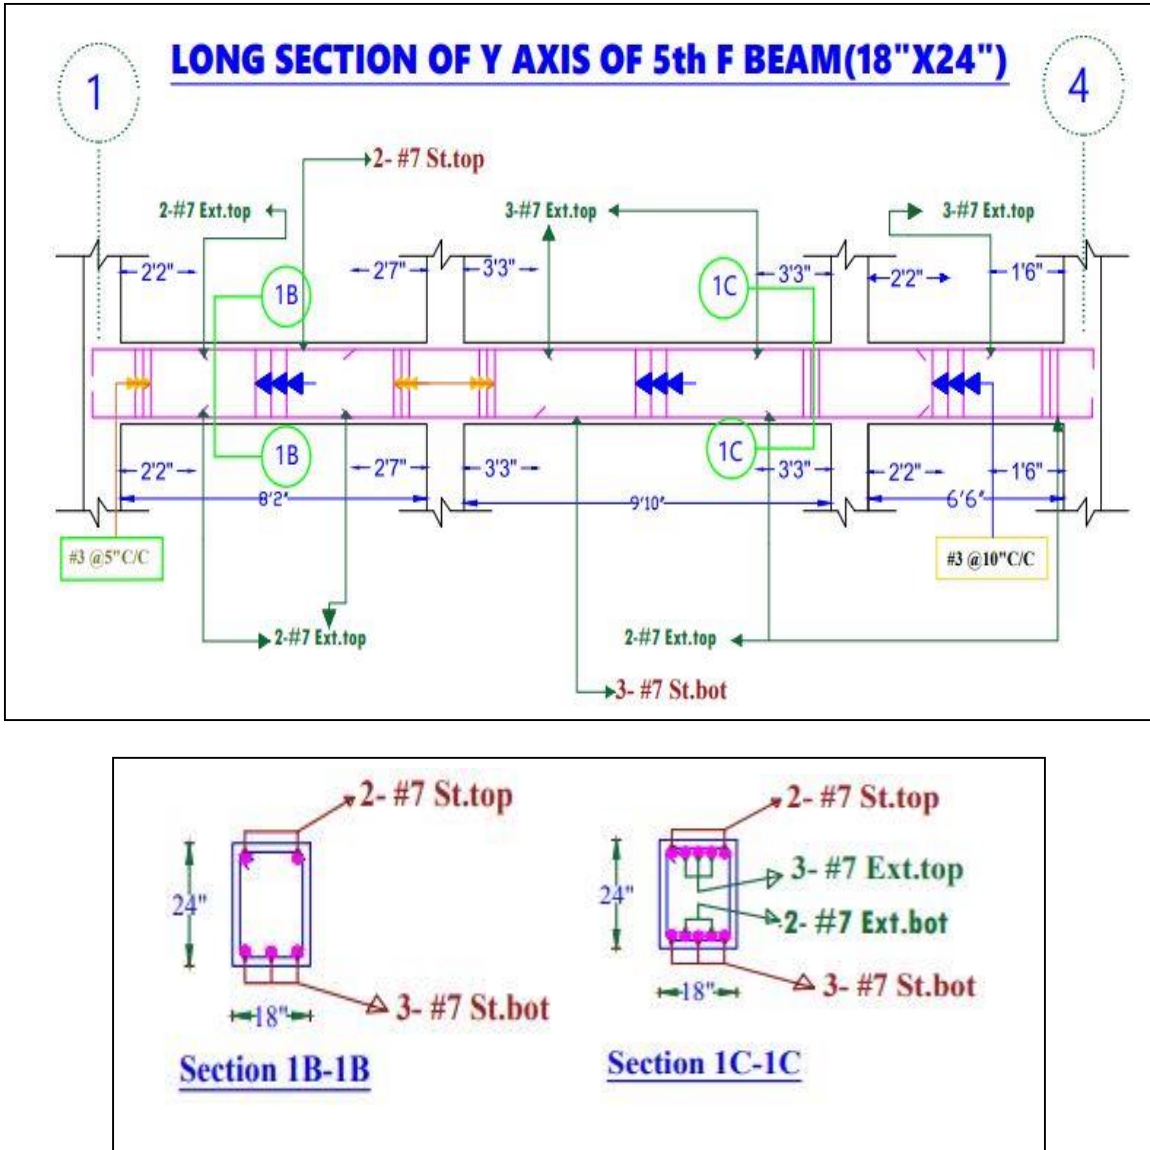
Beam Detailing & Cross Section of Y-axis
